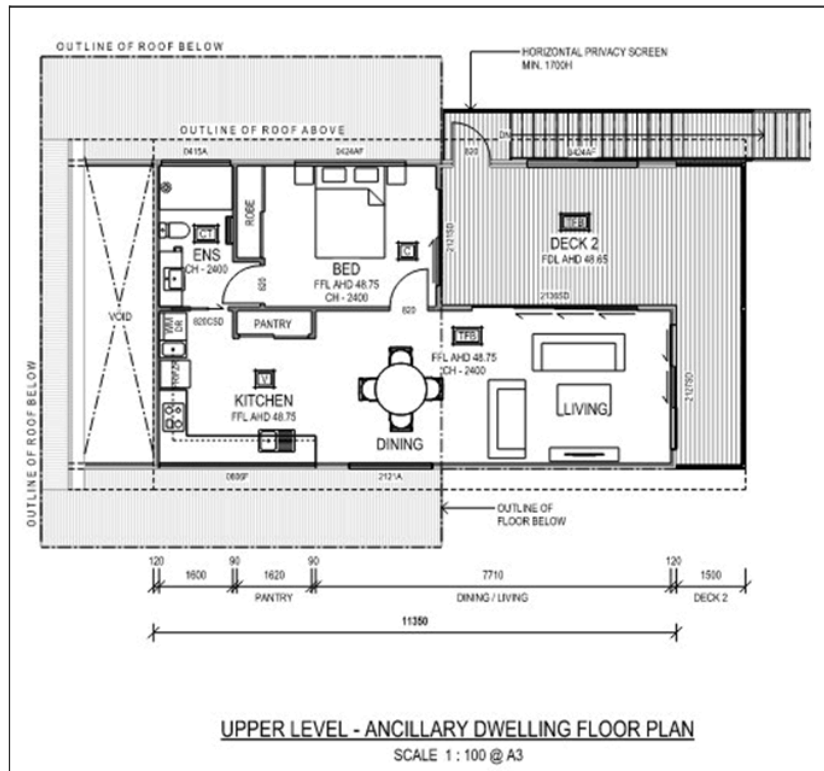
upper level floor plan of the proposed building at 127 Warwick Street, West Hobart.
